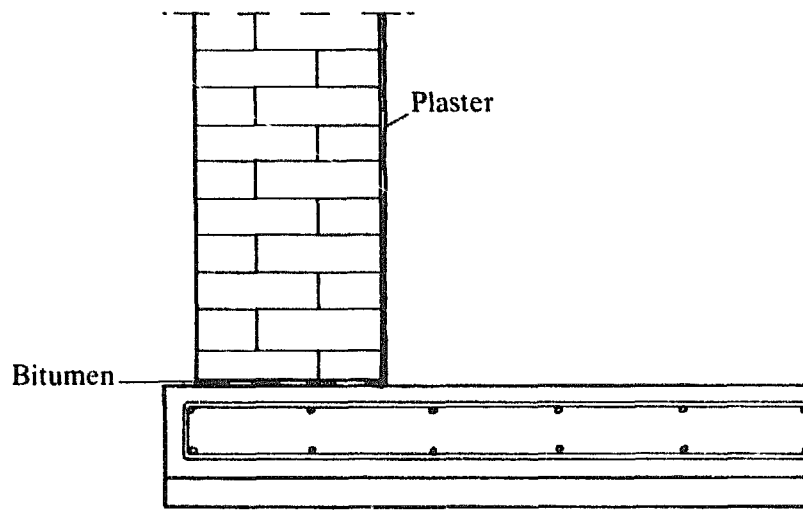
Wall-floor connection in masonry and reinforced concrete
